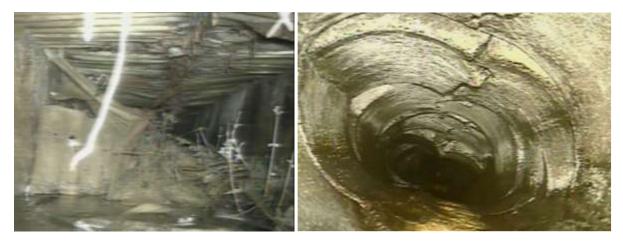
Failing pipes near Marie Street, Inglewood (left) and under railway near Autere Street (right)
